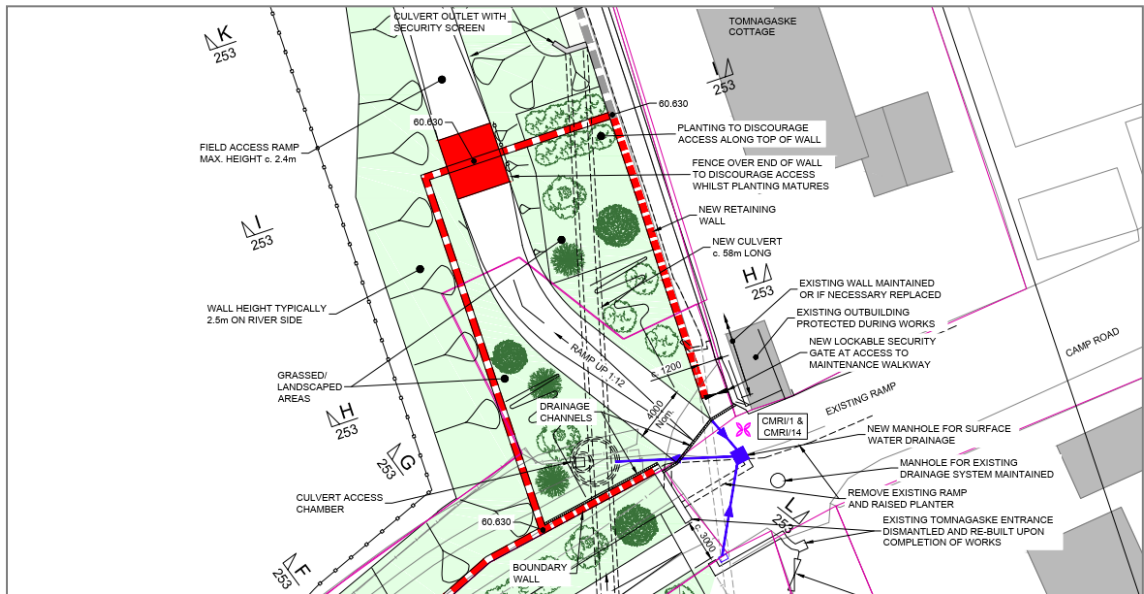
Camp Road arrangement, proposed drainage in blue
